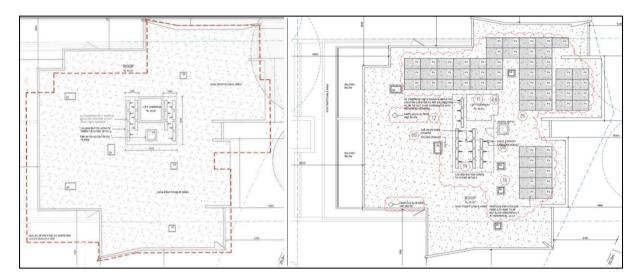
Approved Roof Plan – DA107 Issue B (left) and Proposed Roof Plan – DA107 Issue F (right)
